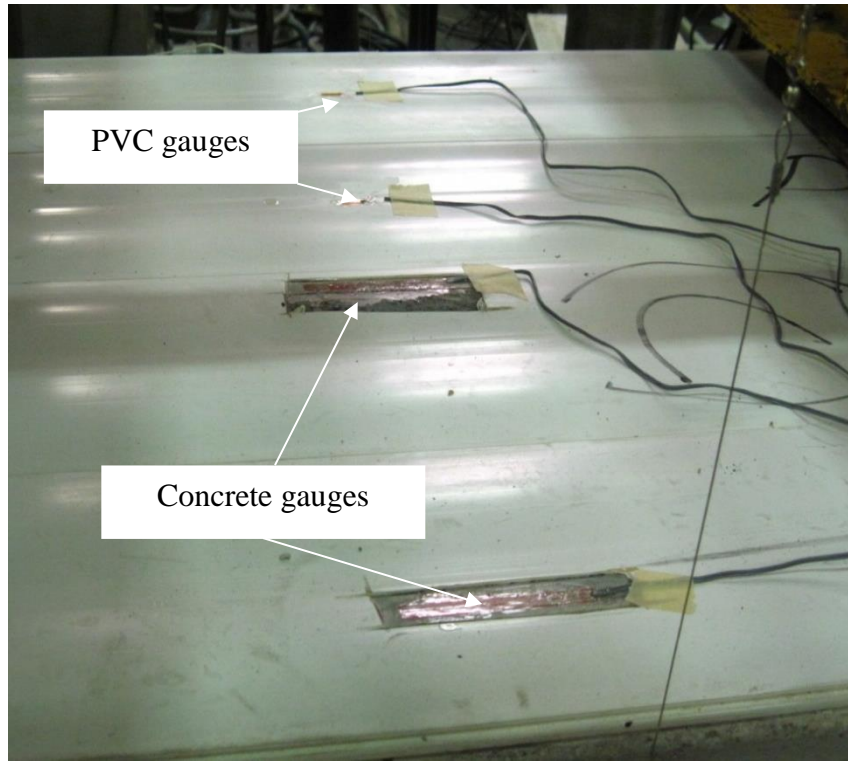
Concrete and PVC strain gauges on the compression face of the wall
